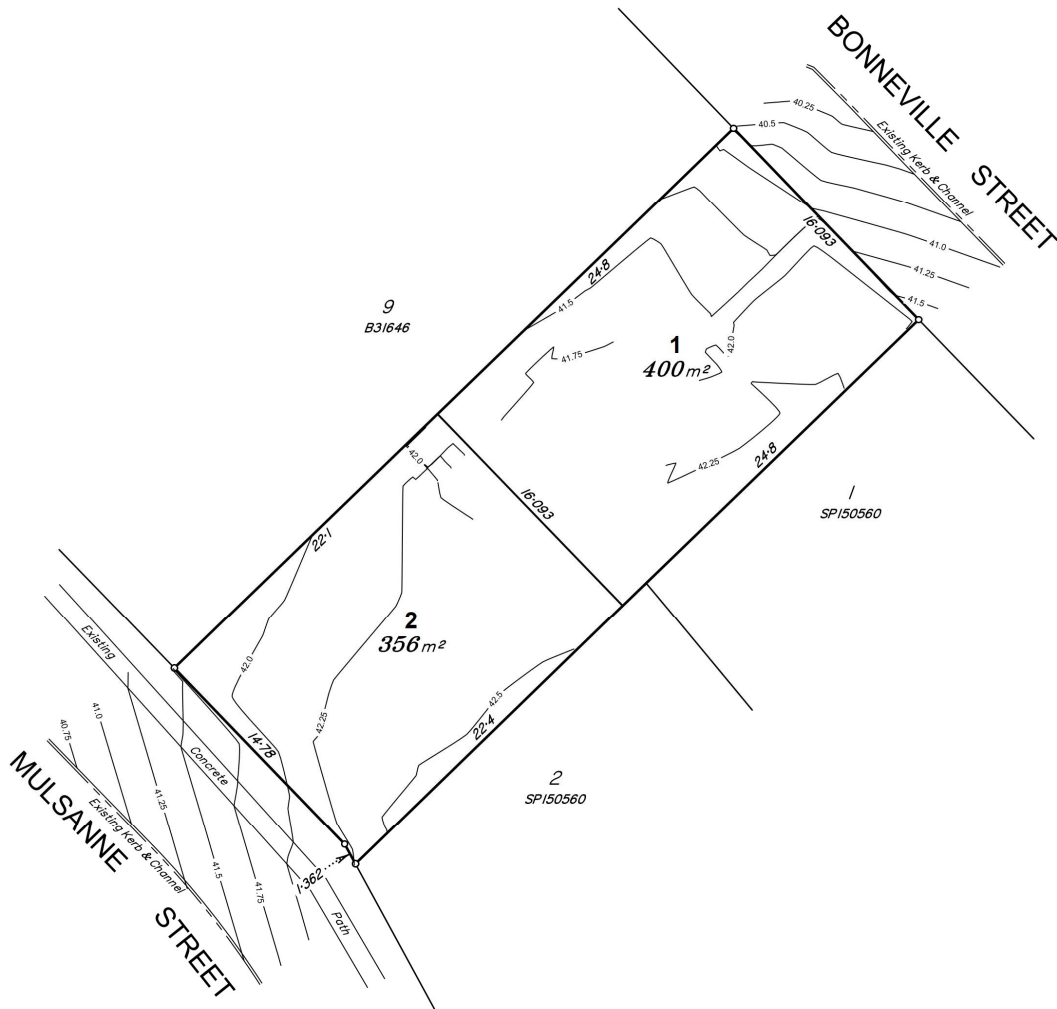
Extract Subdivision Plan (Source: Legacy Survey Drafting)
